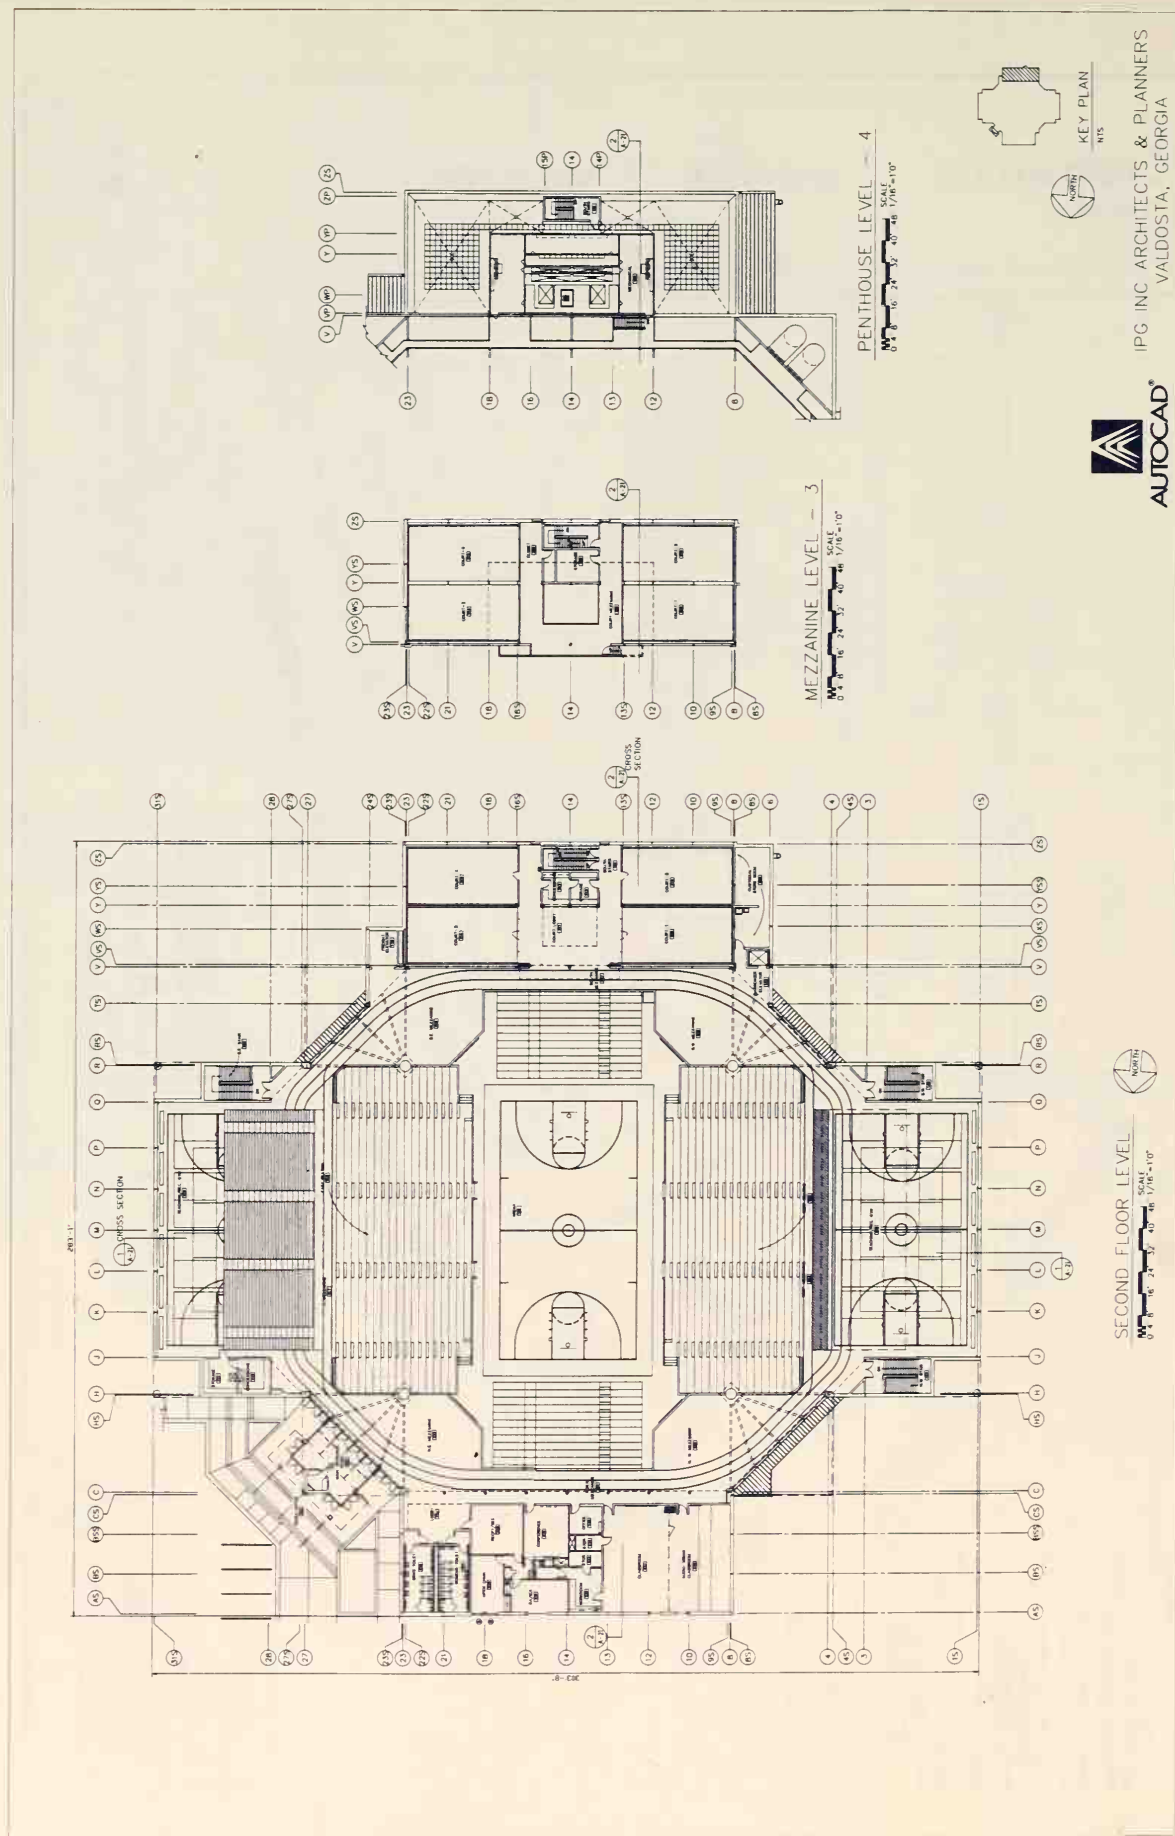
Sample CAD drawing (Courtesy Autodesk, Inc.)
